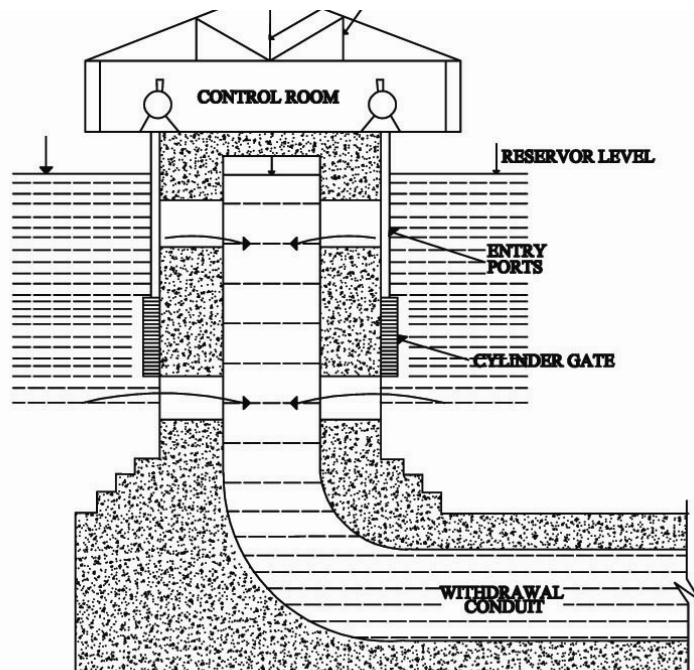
DRY INTAKE TOWER STANDING IN THE RIVER OR RESERVIOR
